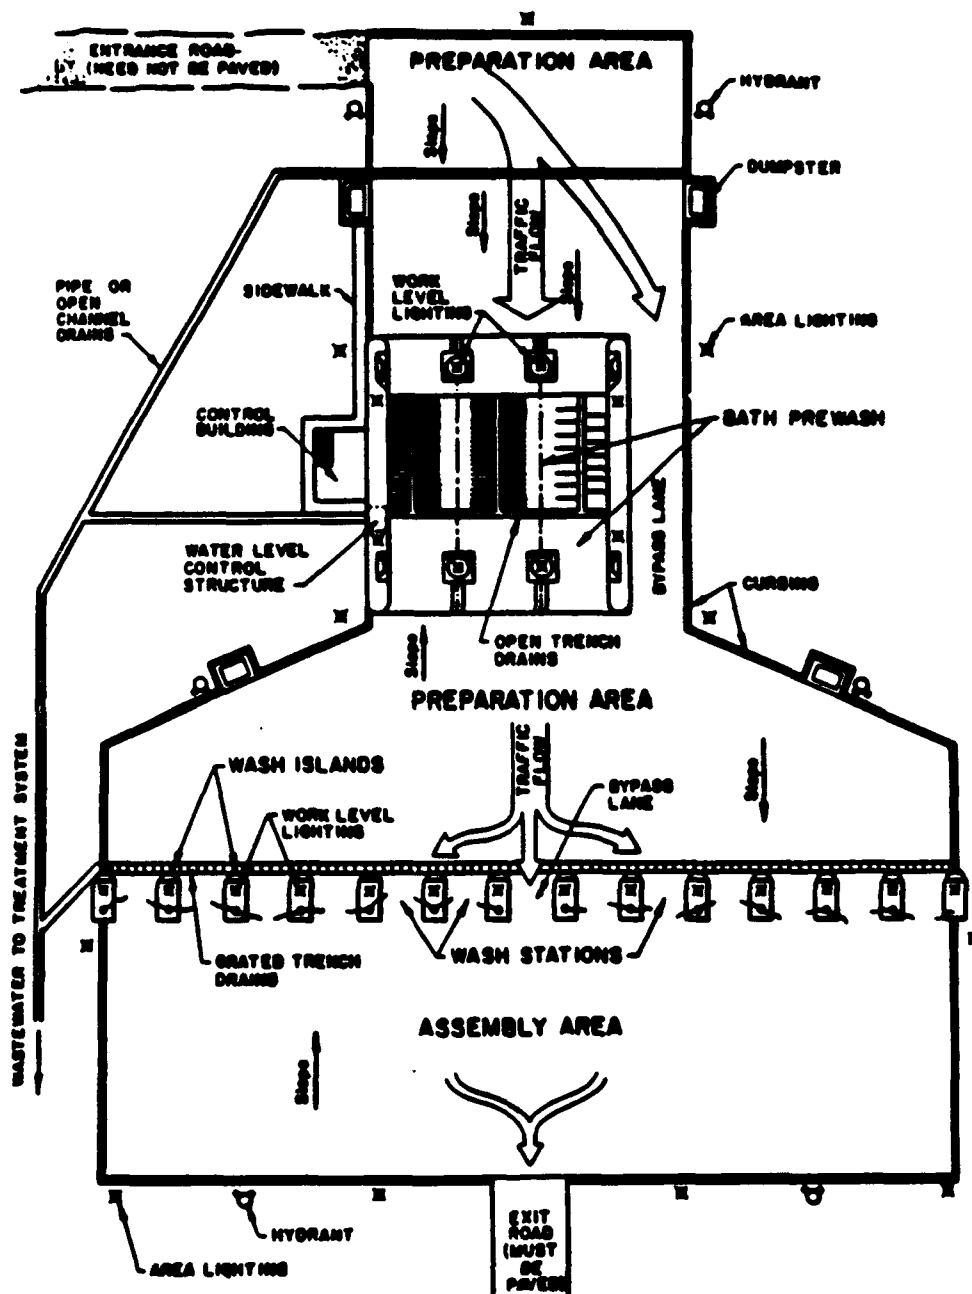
CENTRAL VEHICLE WASH FACILITY PLAN WITH BATH PREWASH
